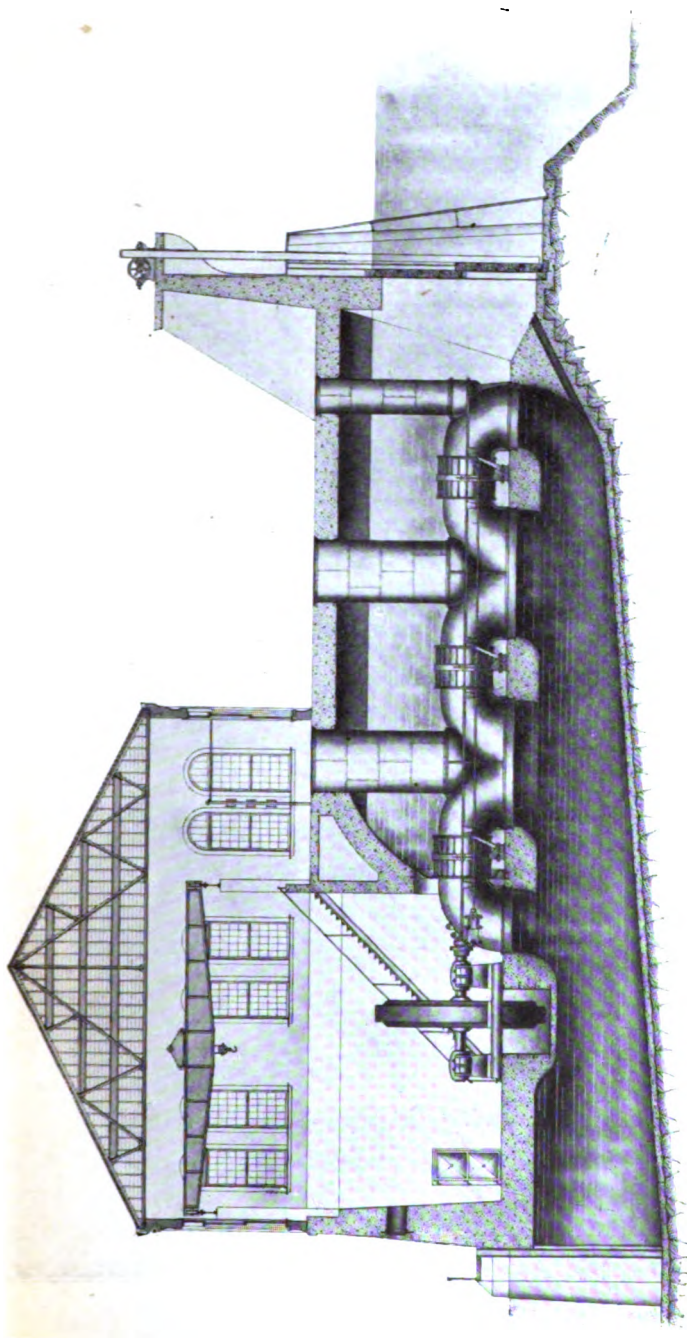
Section of Killbourn Plant, Southern Wisconsin Power Co.
